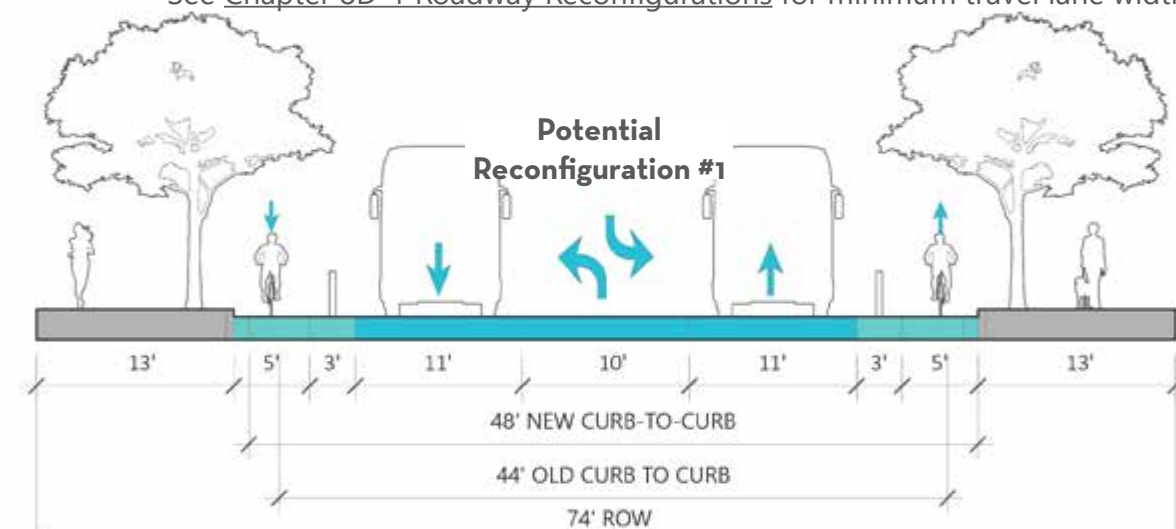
Potential Reconfiguration #1: One-Way, In-Street, Class IV Bikeway on a Downtown Collector Street.
